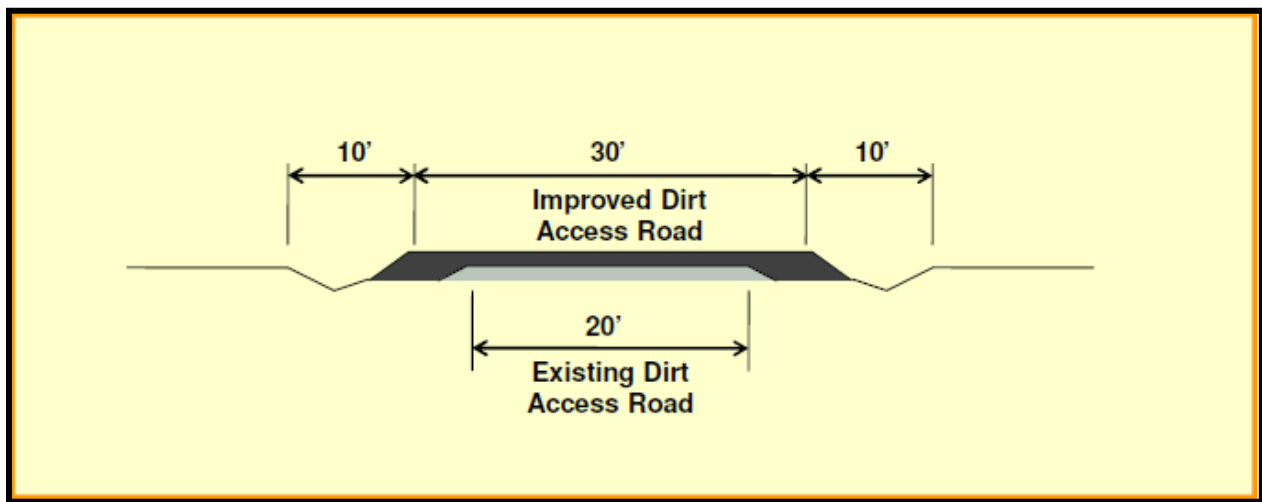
Typical Gravel or Dirt Road Upgrade Section and Easement for Temporary Construction Access
